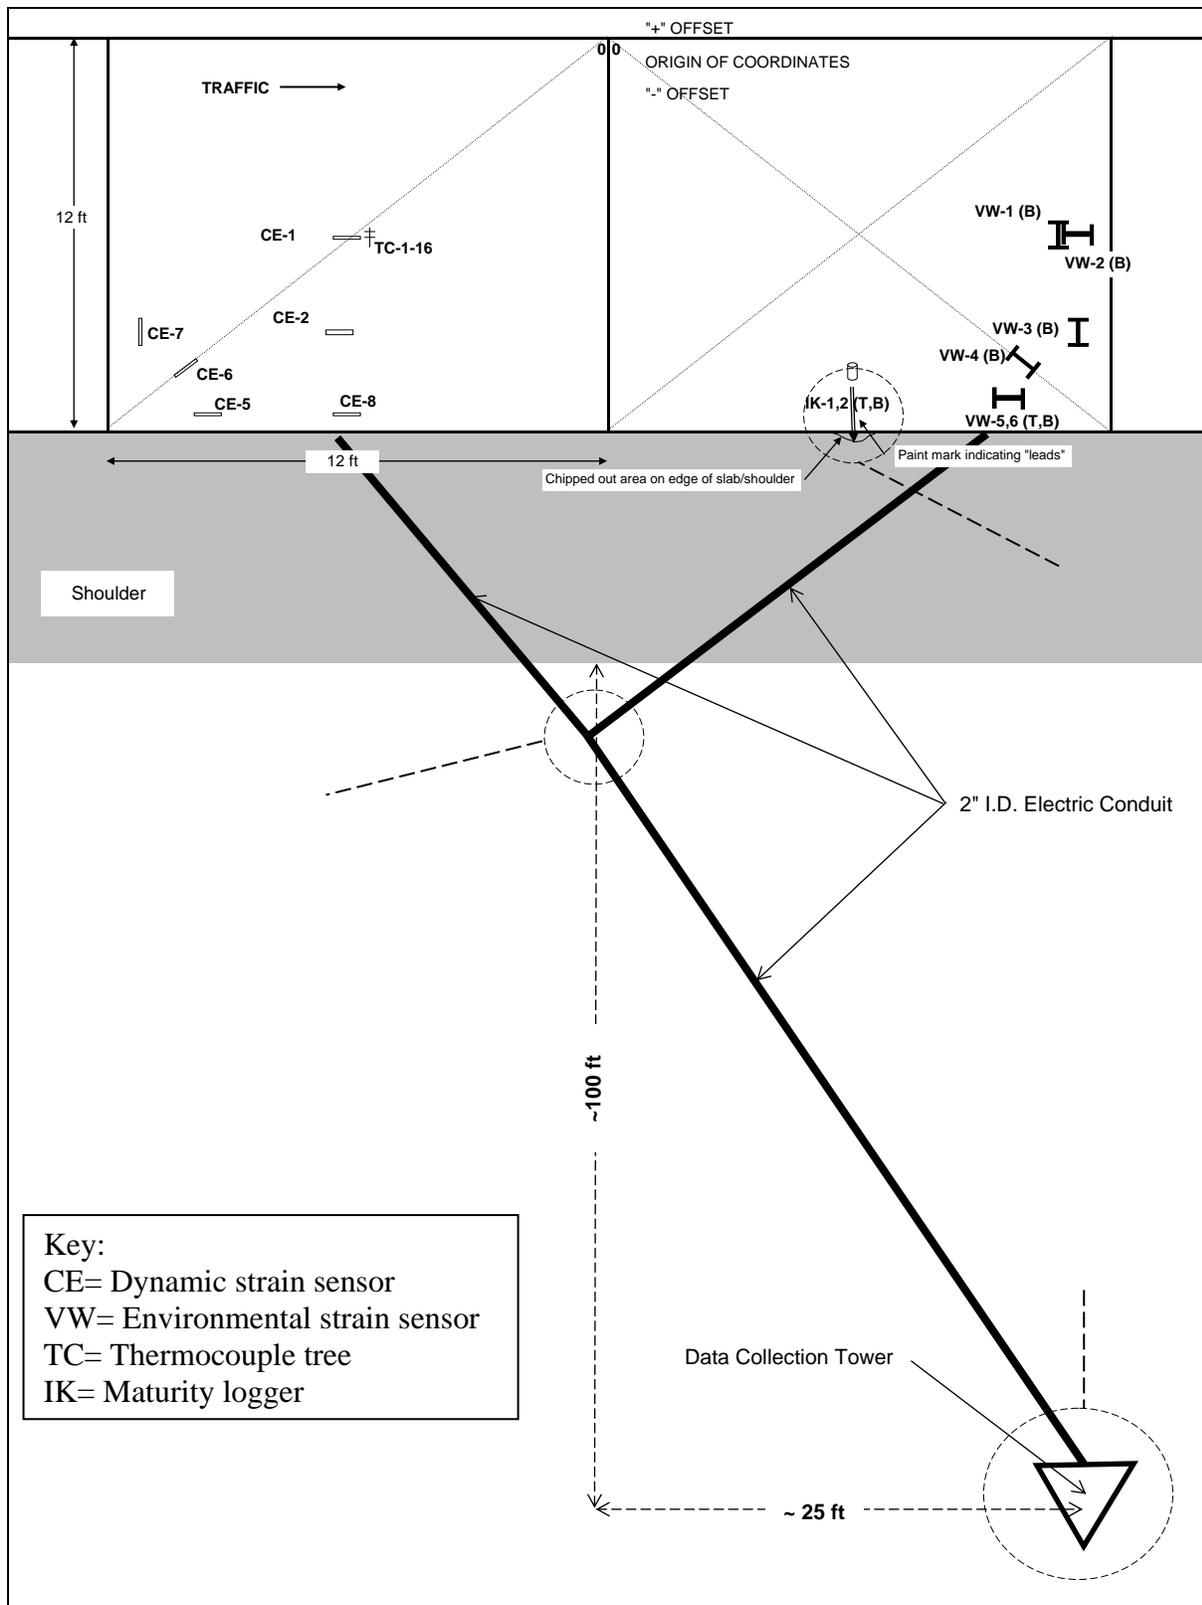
Cell 53-1 Instrumentation and Data Collection System Layout
